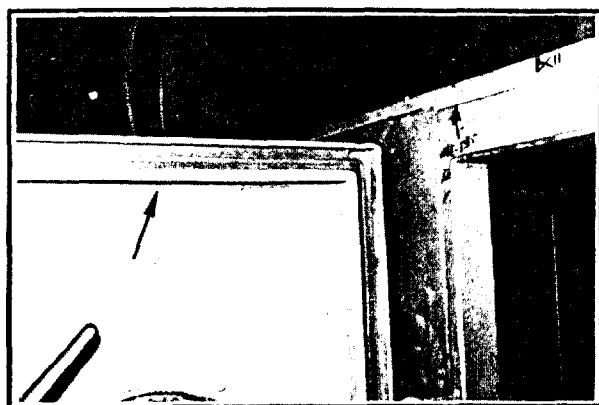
Single-pin hinge causes gasket roll on hinge side of door. Door cannot be sealed.
